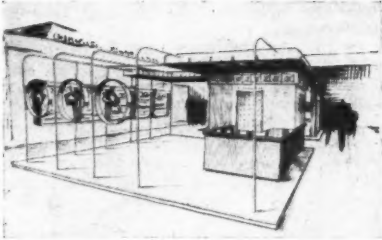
Tropical wall structure by S.M.D. (Stand E 96.)
